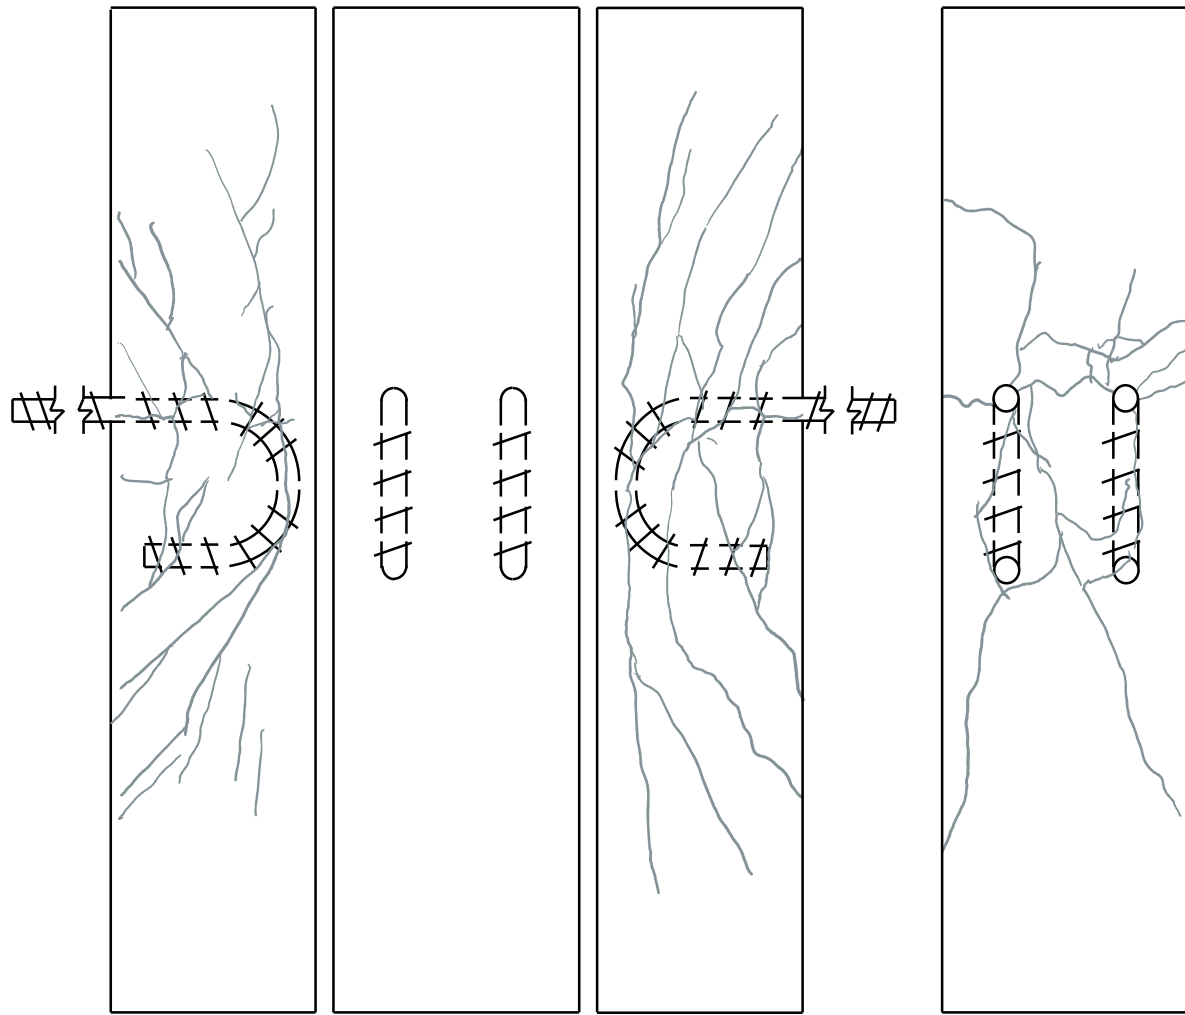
Crack pattern at maximum normalized tensile load for beam-column joint specimen MD4-180: (a) west side face, (b) back face, (c) east side face, and (d) front face
